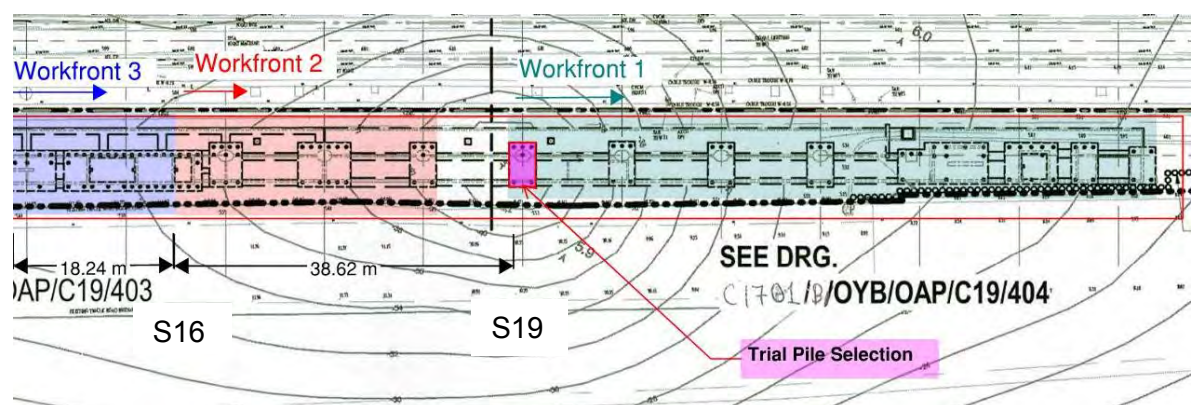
Mini-Pile Layout Plan (2)
